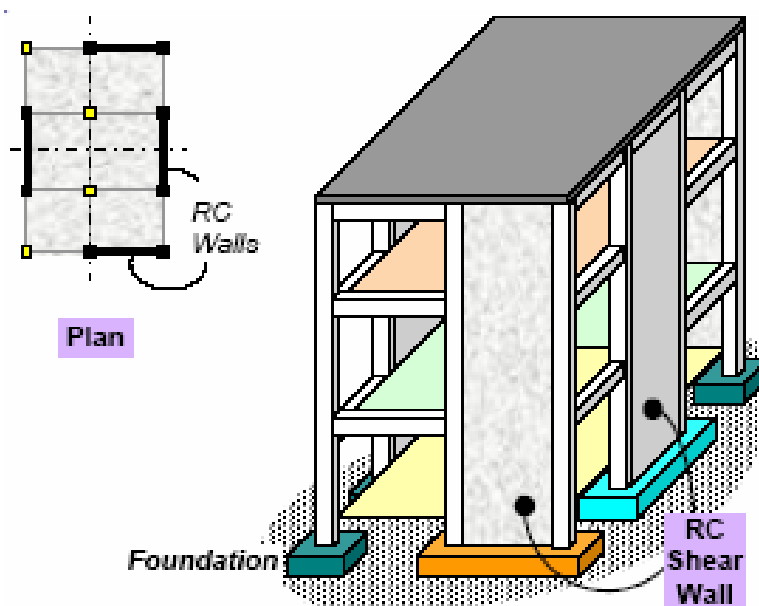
Reinforced concrete building with frames and shear walls (Ref. 0.16)
